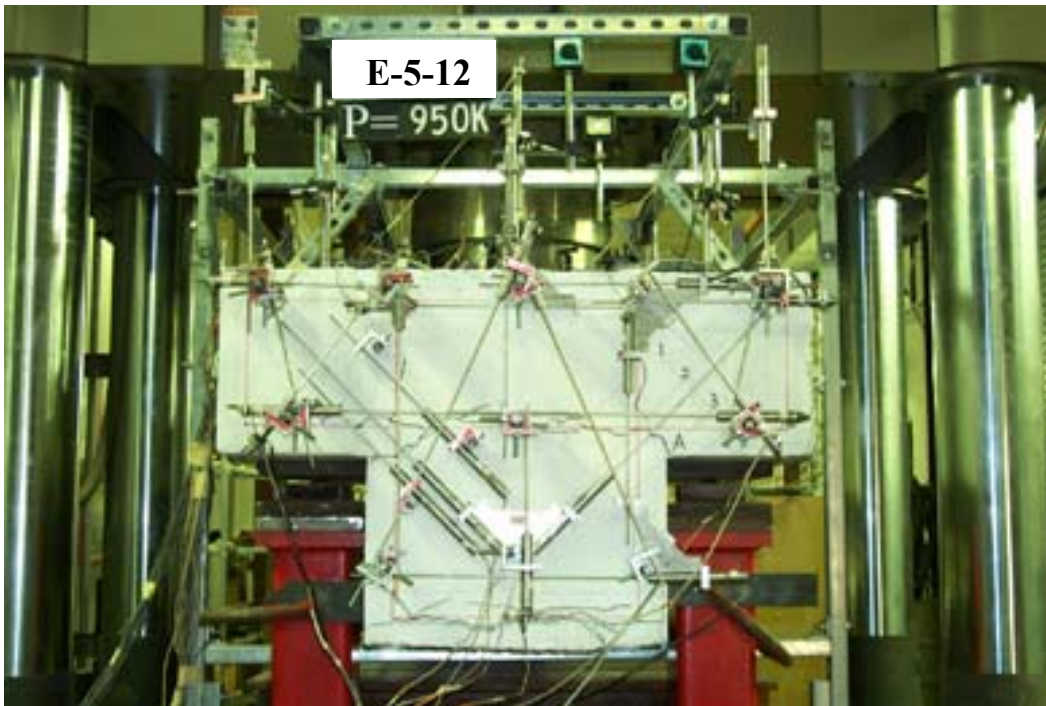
(h) Horizontal and diagonal cracks in Specimen E-5-12
